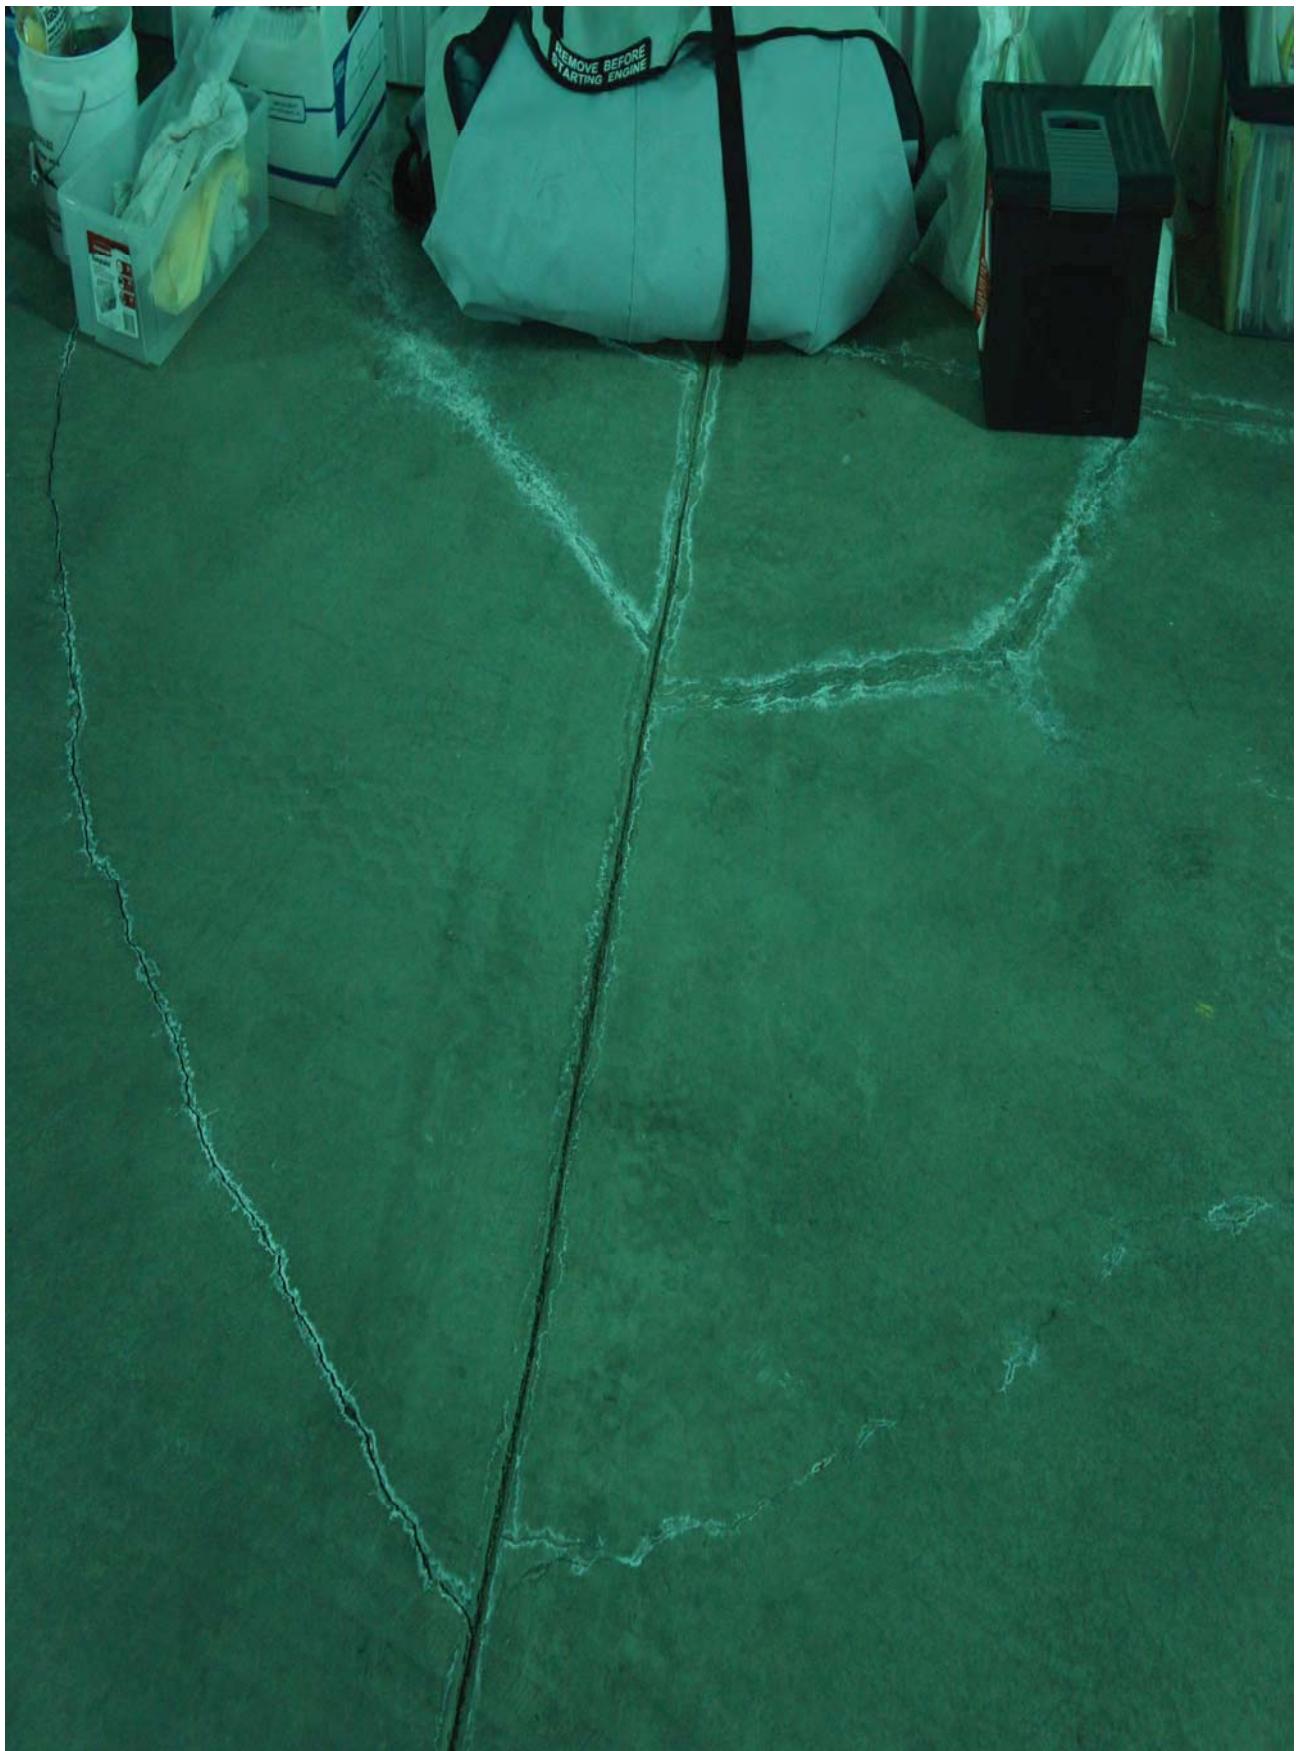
Cracking and moisture staining in slab in Hangar H (Building 15).
